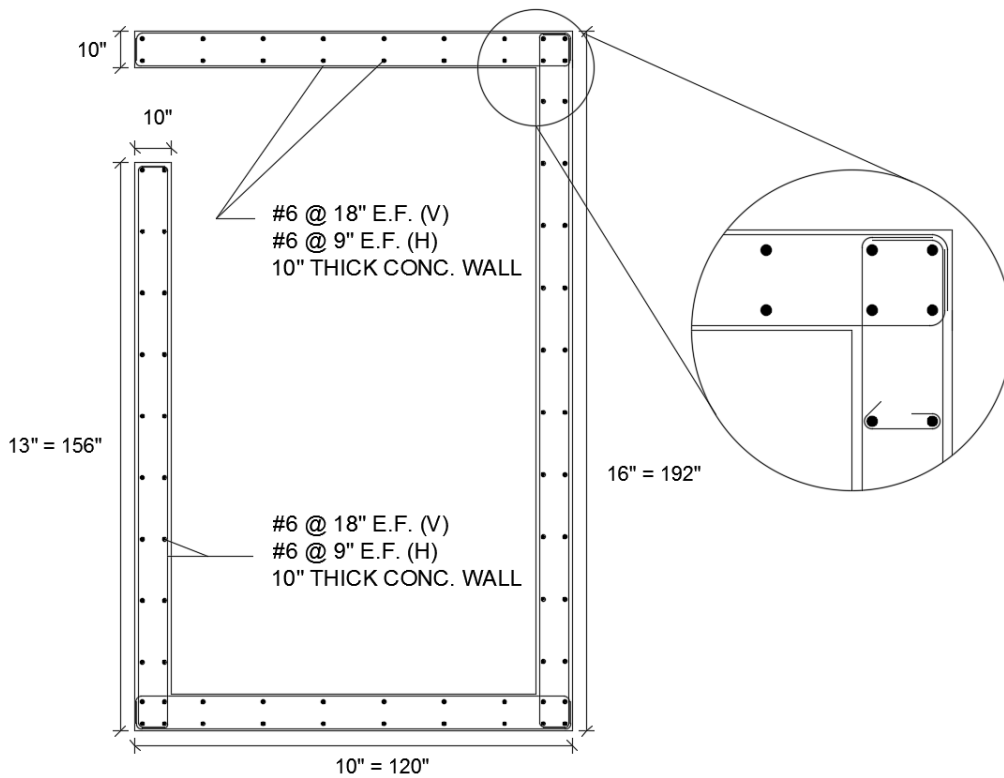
Original stairwell shear wall cross-section at the 3rd floor level
